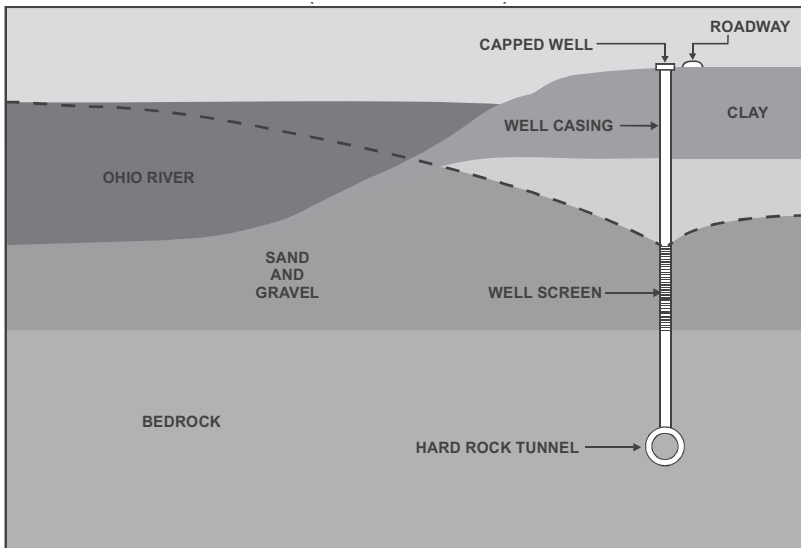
Vertical Wells Connected by Hard Rock Tunnel (Looking Upstream)
